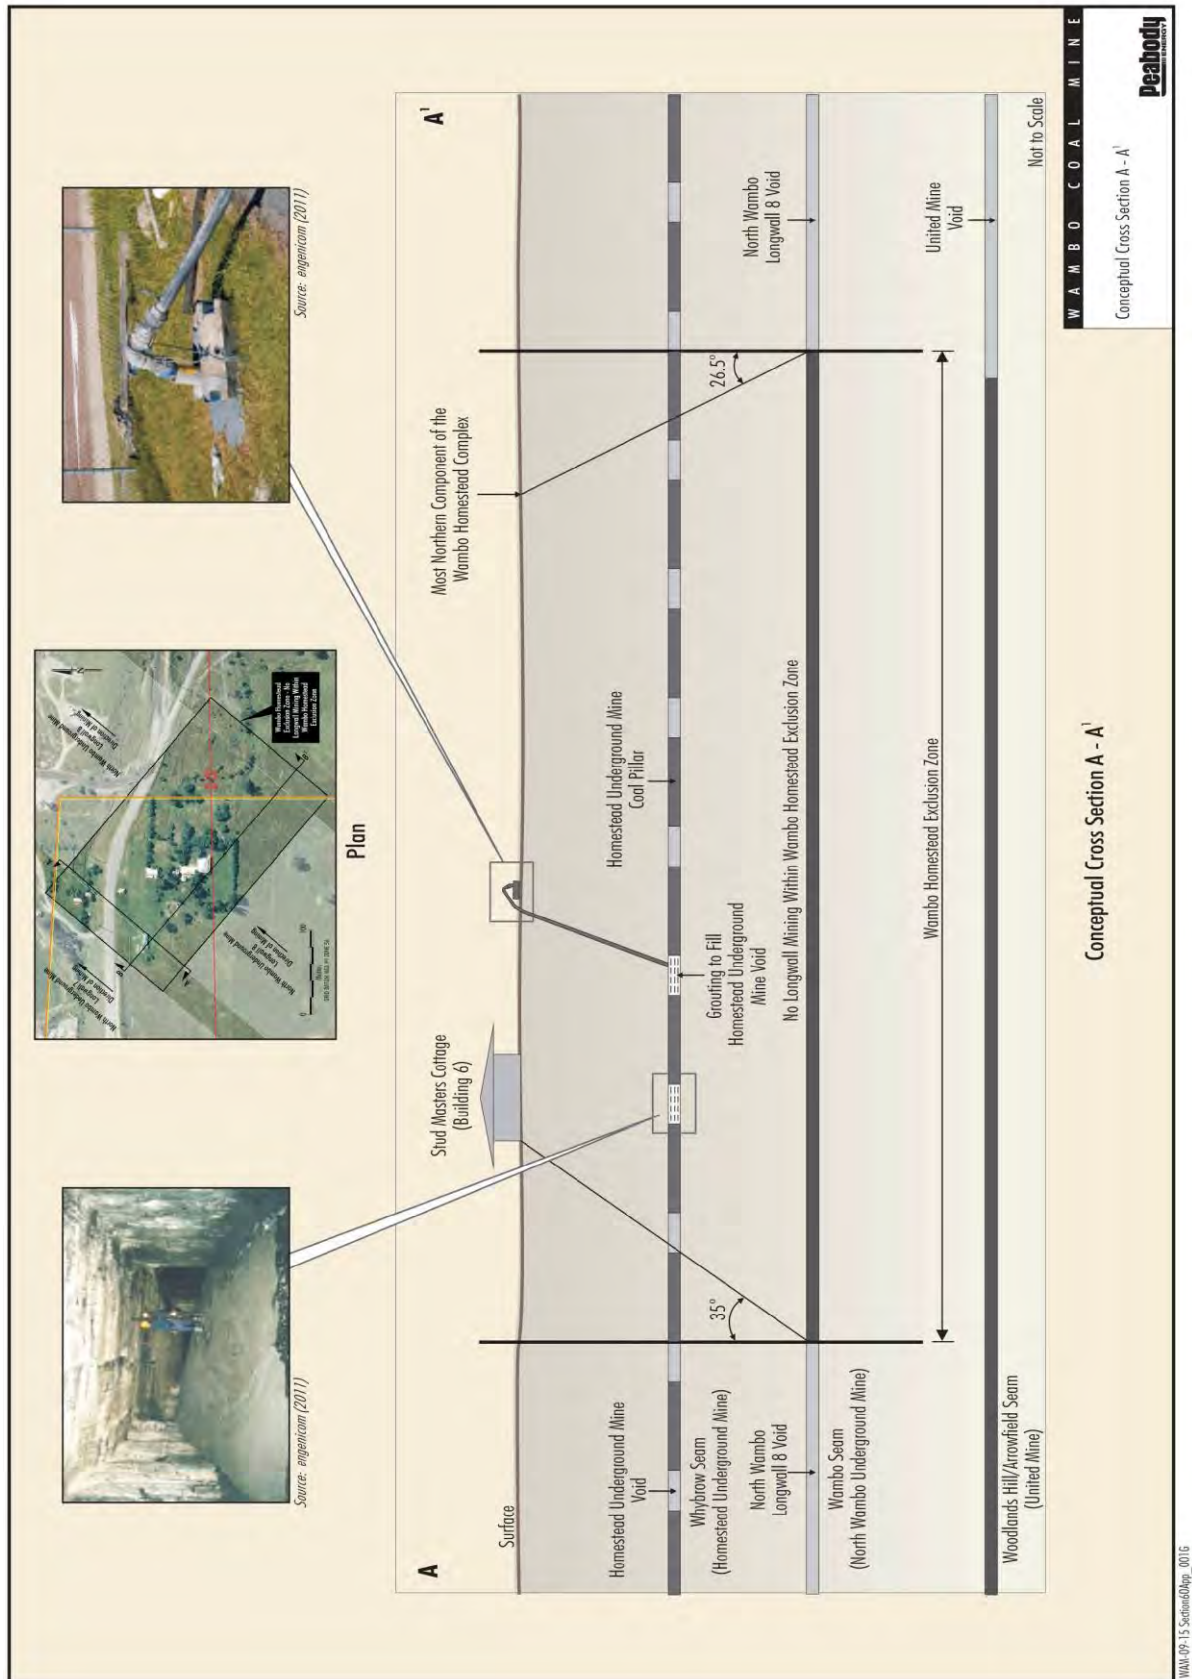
Conceptual 3D cross section of WHC and proposed underground mining.
